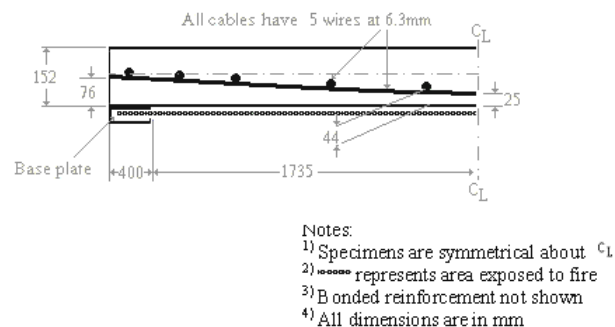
Underwriters Laboratory slab (after UL, 1968).
